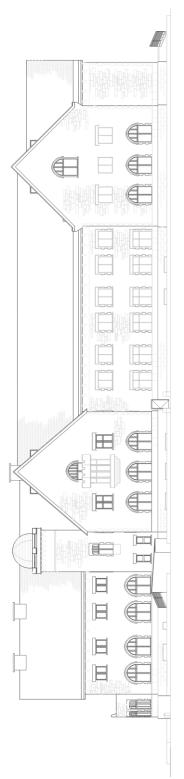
Sketch south elevation, not to scale. (JLK Architects 2025)
